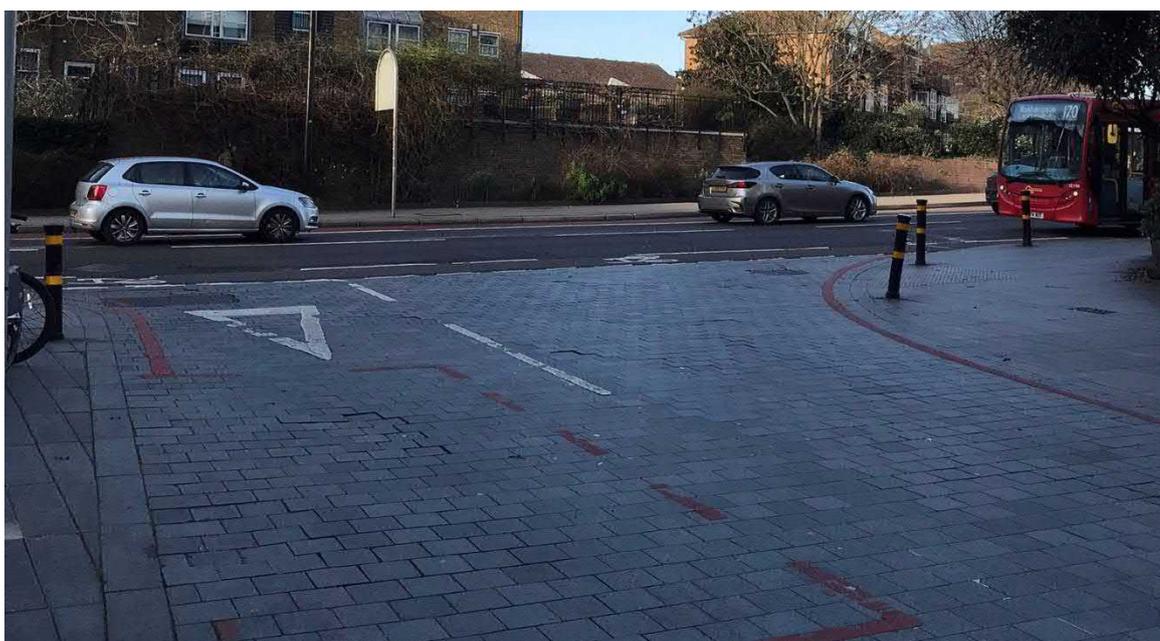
View West From Hester Road Towards Battersea Bridge Road
